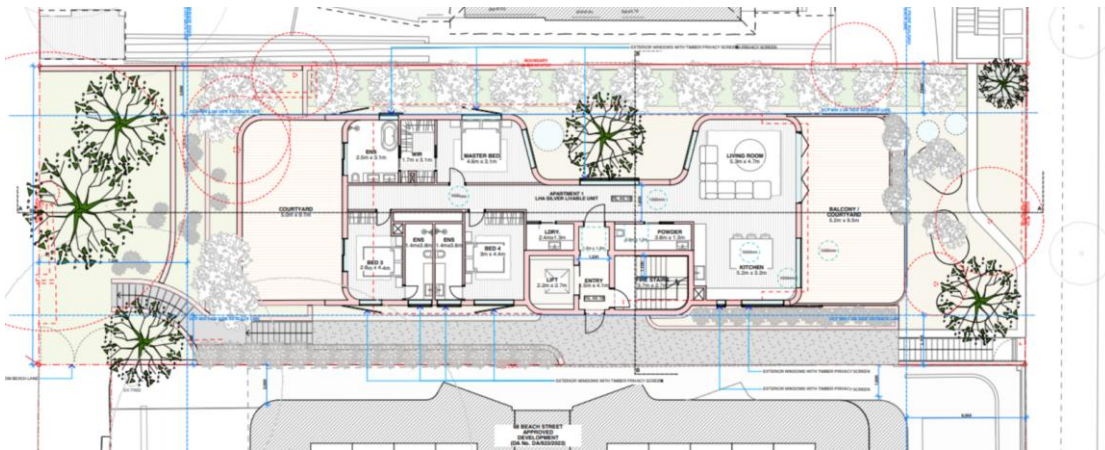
Ground floor plan as originally proposed (Source: Roth Architects)
